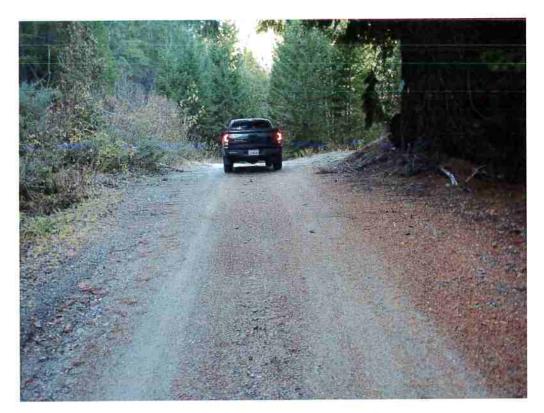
RP 22. Vehicle traveling west, photo taken facing west.
